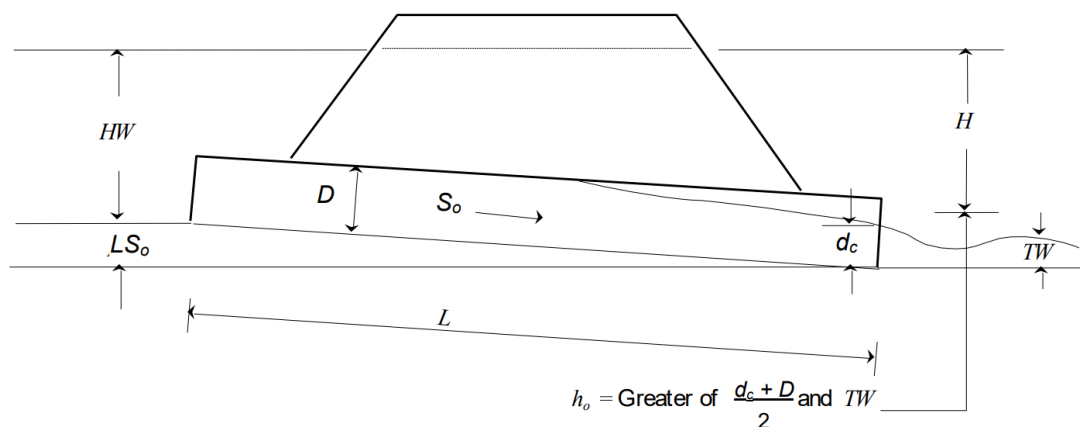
Hydraulics of culvert flowing full under outlet control
